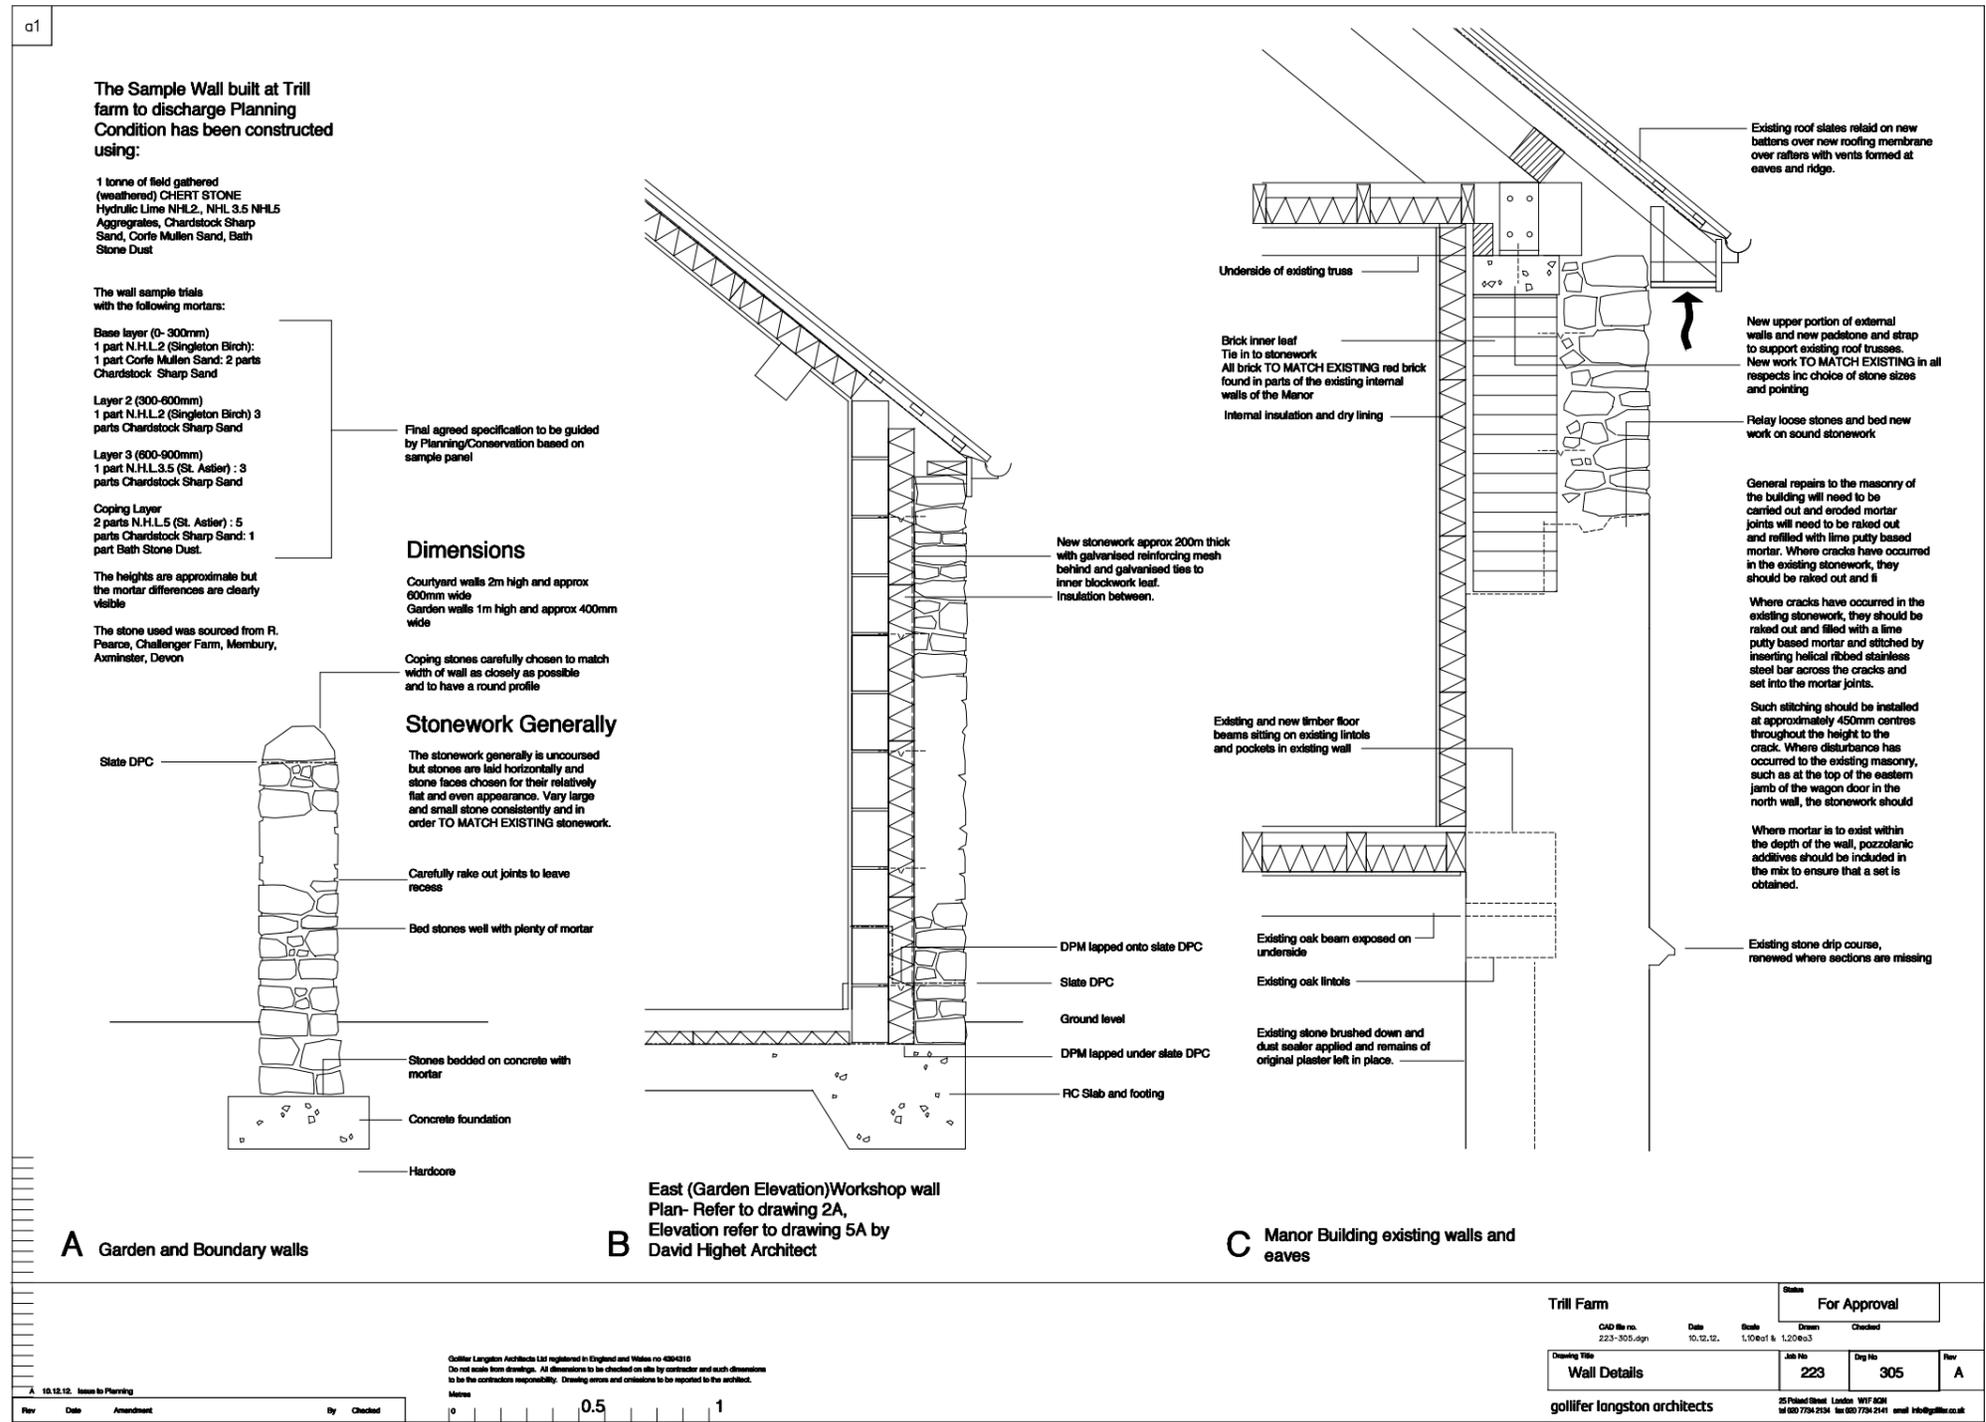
The approved detail drawing by messrs Gollifer Langston Architects is Drawing No. 223-305 revision A - titled 'Wall Details'
